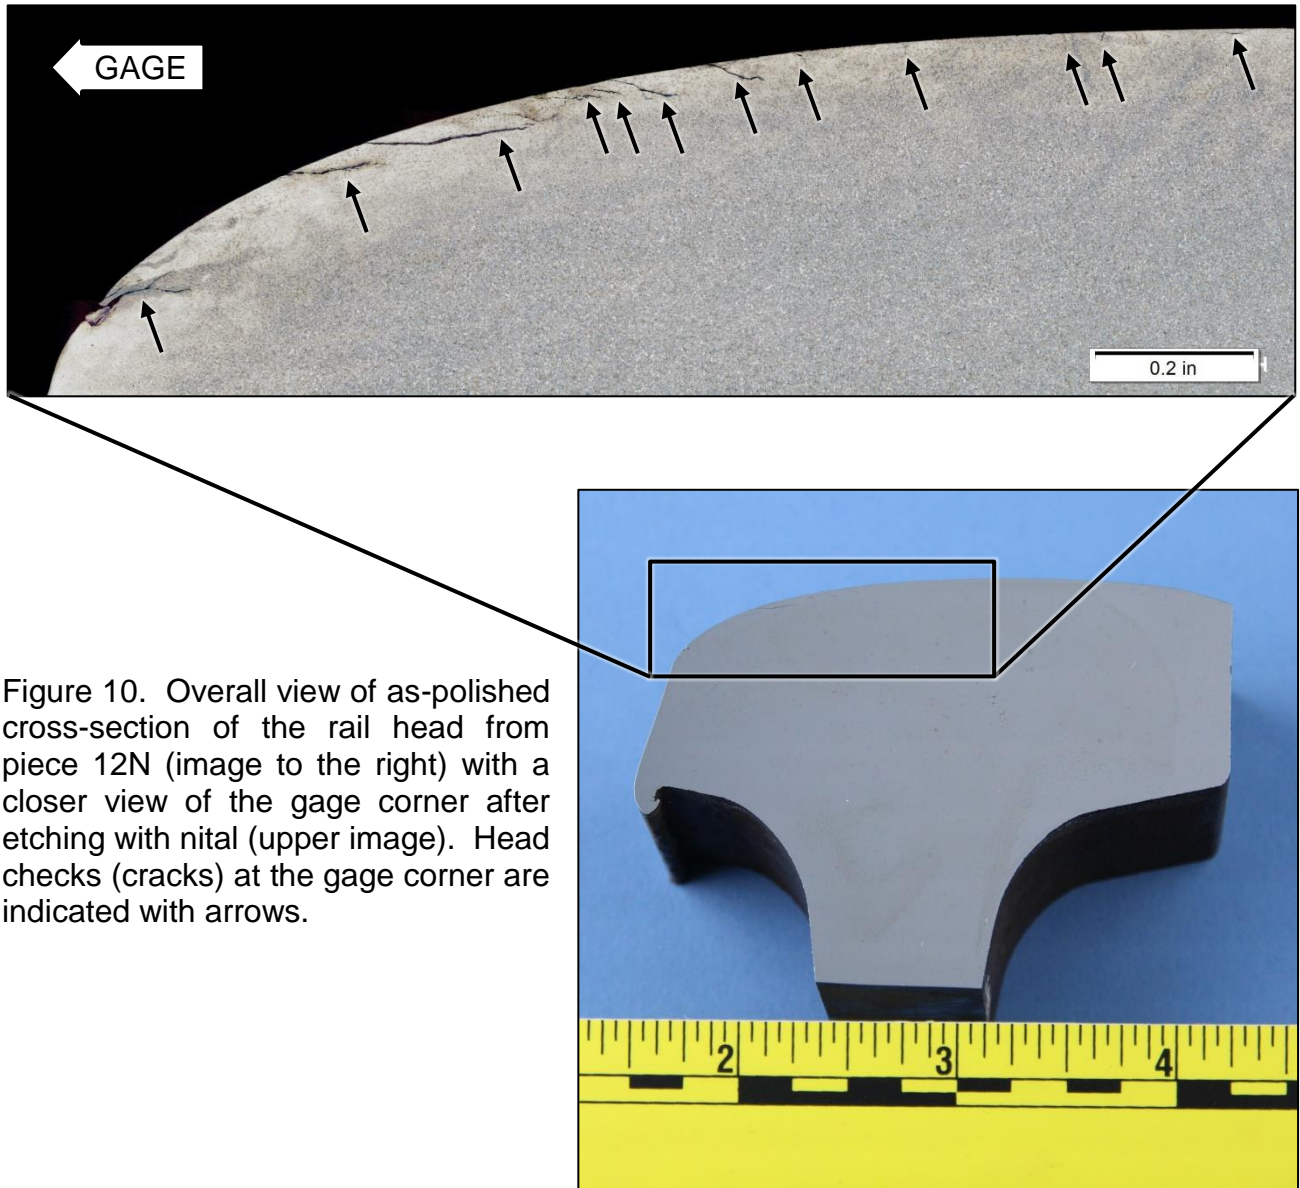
Overall view of as-polished cross-section of the rail head from piece 12N (image to the right) with a closer view of the gage corner after etching with nital (upper image). Head checks (cracks) at the gage corner are indicated with arrows.
